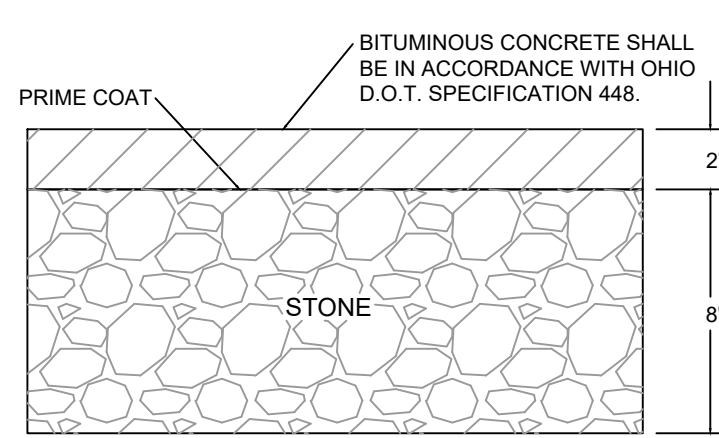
DETAIL FOR USE TO REPAIR UTILITY TRENCH FAILURE
